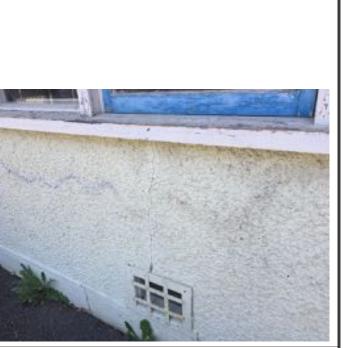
Hairline crack, stains, and deteriorating stucco coating
